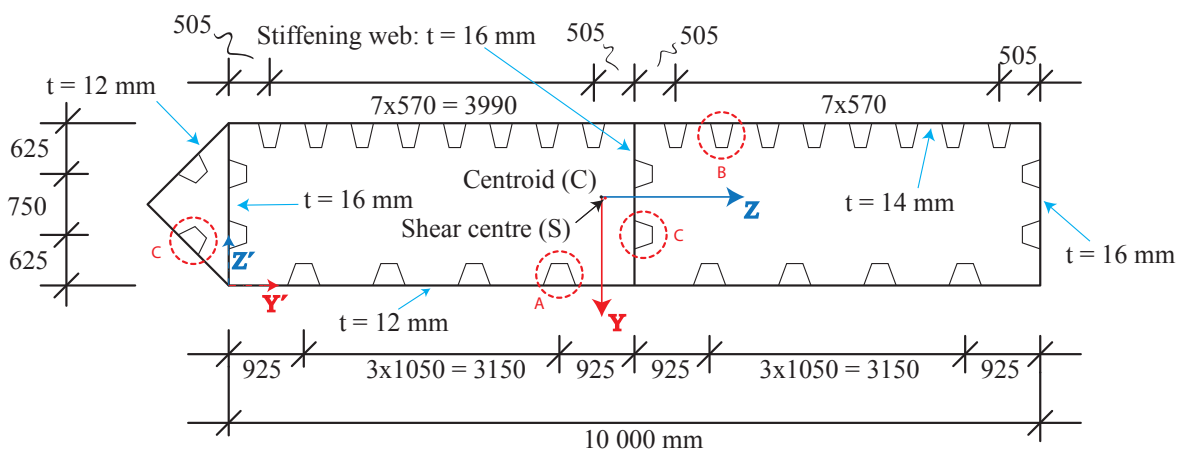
Box-girder with stiffeners modelled in CrossX.
